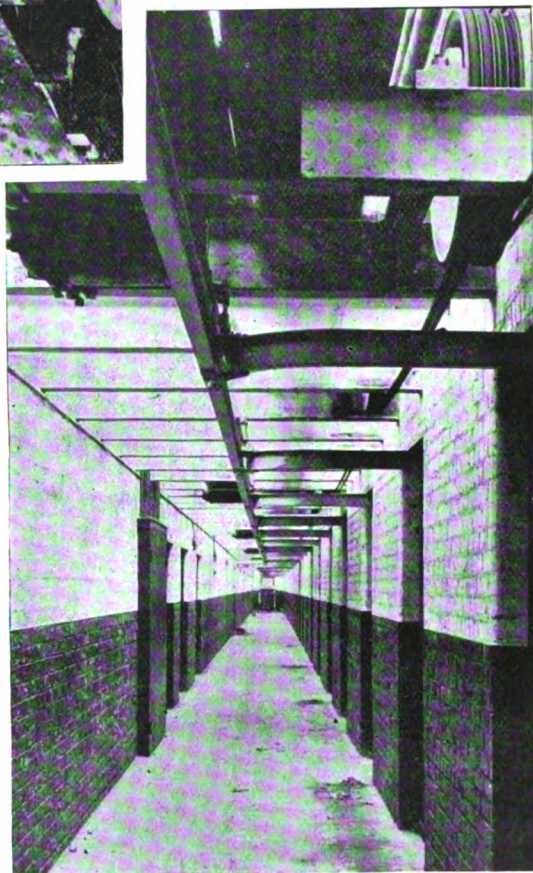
MOTOR ALLEY. VIEW BELOW THE MOTORS.
